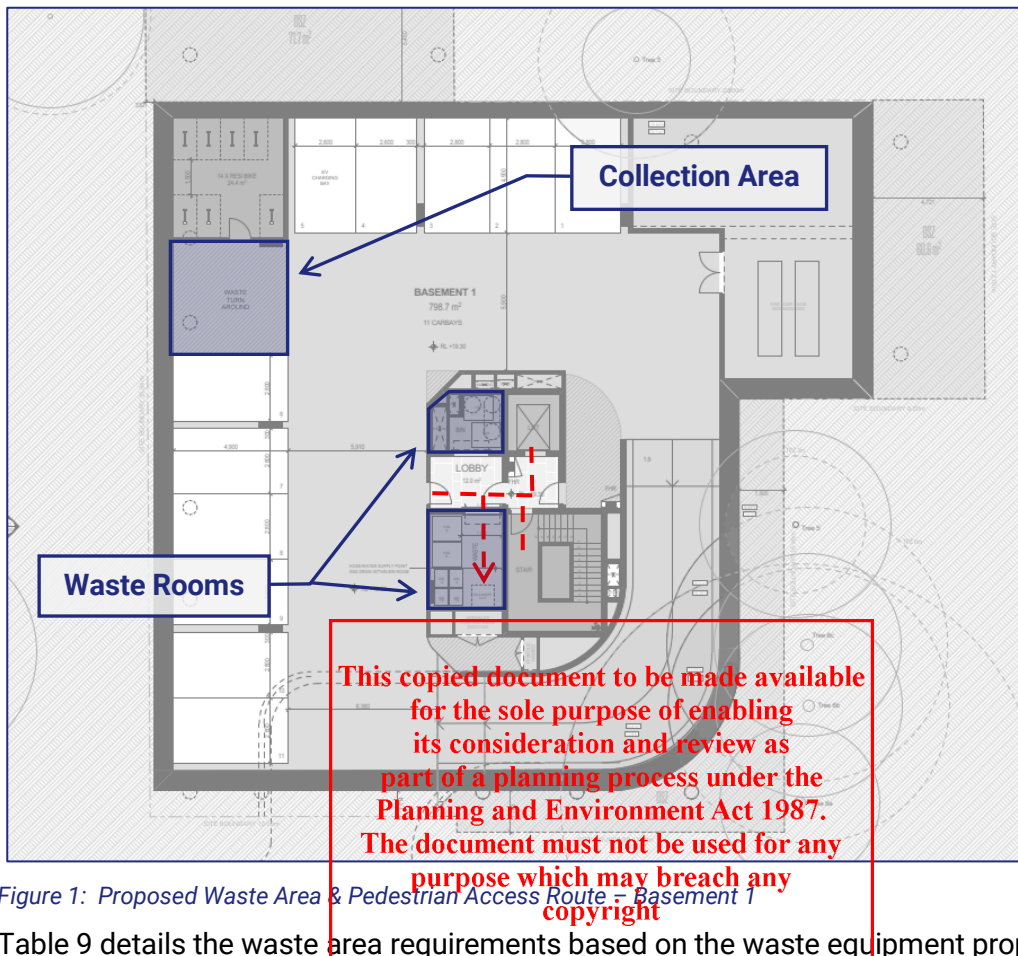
Proposed Waste Area & Pedestrian Access Route - Basement 1
